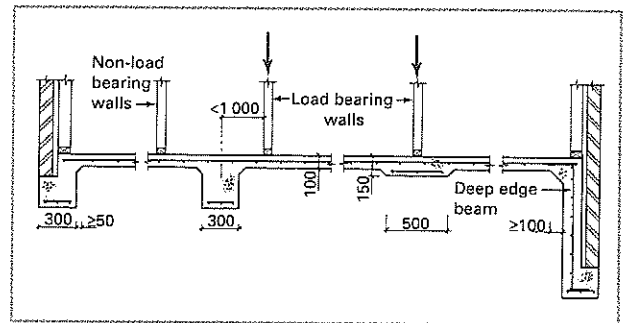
Slab-on-ground for masonry, veneer and clad frames
